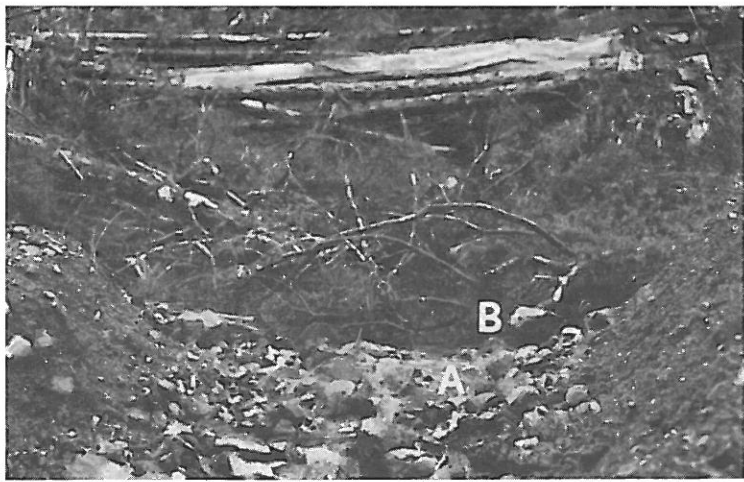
Small fish cannot pass through this culvert because of its elevation above the normal stream bed.
